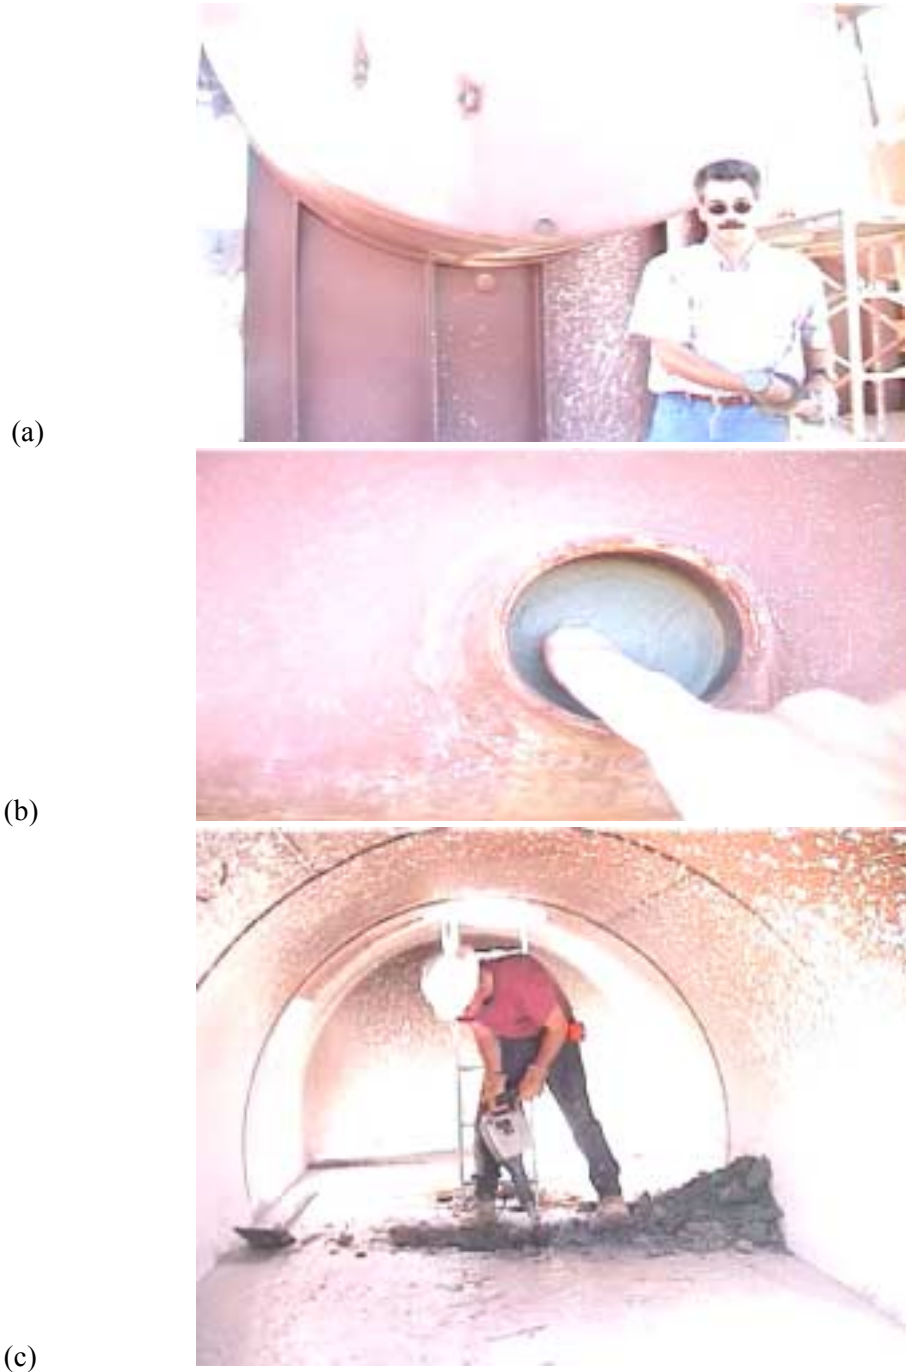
Photographs showing the solidified mass after MPI injection in the SRS test tank: (a) general view of tank bottom drain, (b) close-up of grout filled drain, (c) general view of tank floor interior during sample excavation.
